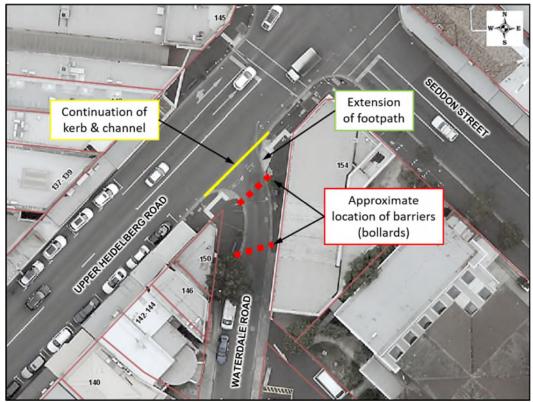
Waterdale Road, Ivanhoe at Upper Heidelberg Road – Proposal Traffic Response
